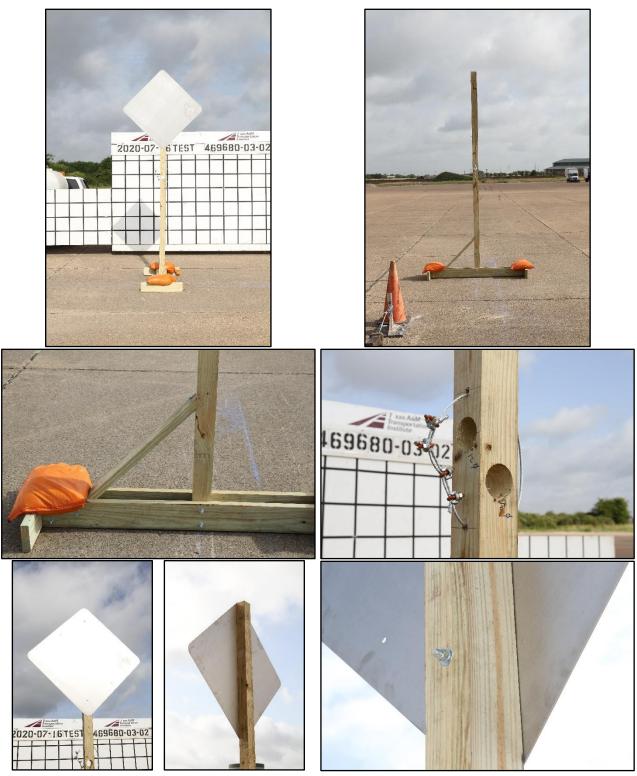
Modified TxDOT Single Skid-Mounted Sign Support (Original) prior to Crash Test No. 469680-03-2.
